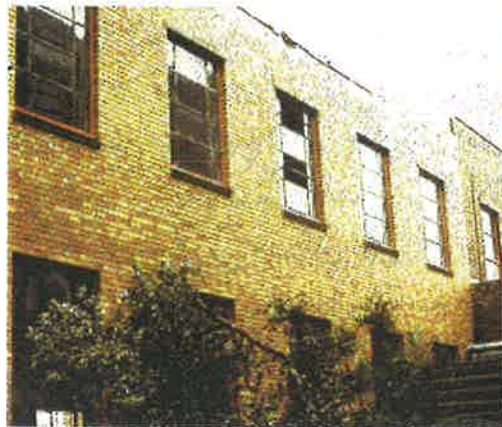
Parapet Failure, Tighes Hill Campus, Newcastle Technical College
